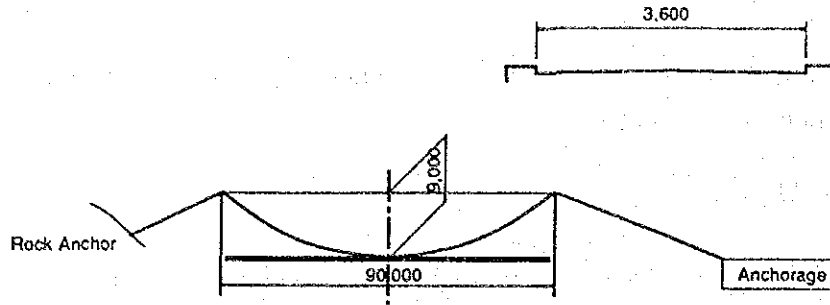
(a) 90 m Span 1-Lane Suspension
